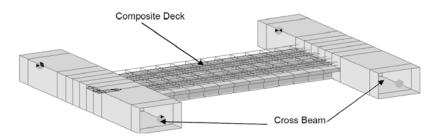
Modelling of railway track slab and its connection to the cross girders between the truss lower chords
